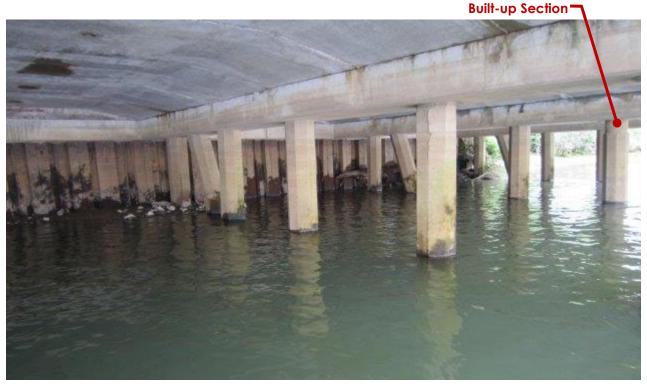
Piles and Pile Caps (Looking Northwest)
